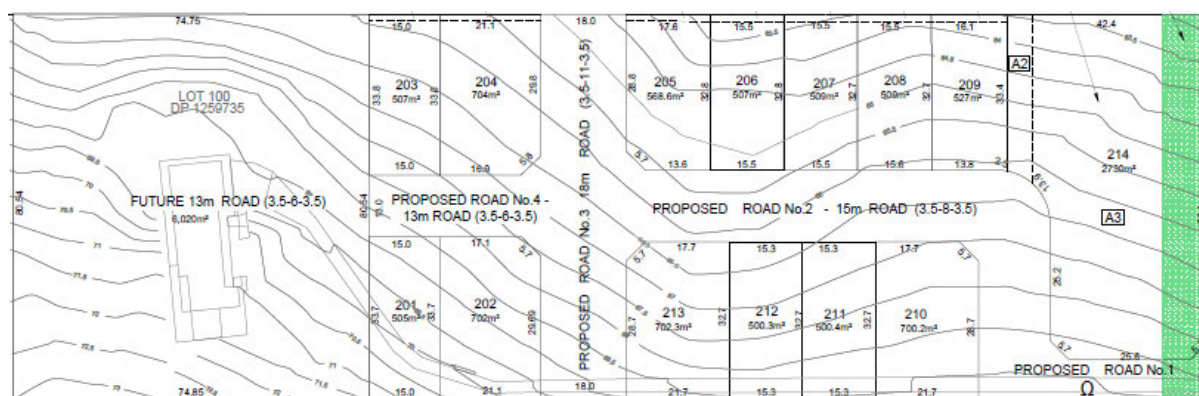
Approved Subdivision Plan of Lot 101 Bensley Road
